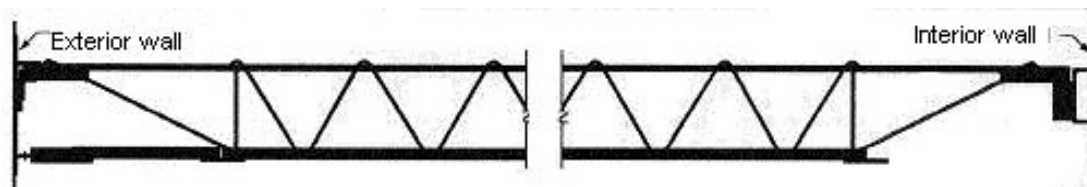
Floor truss member of WTC 1 & 2 (FEMA, 2002)
